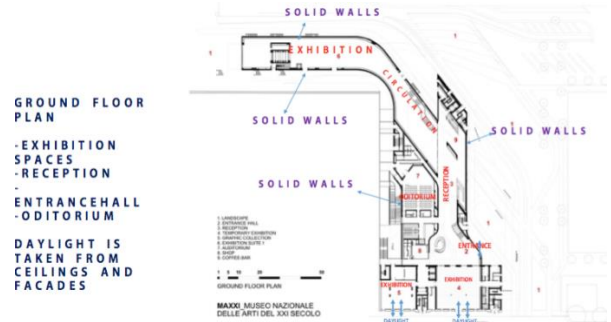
Drawings; plans; ground and first plans, daylight analysis
